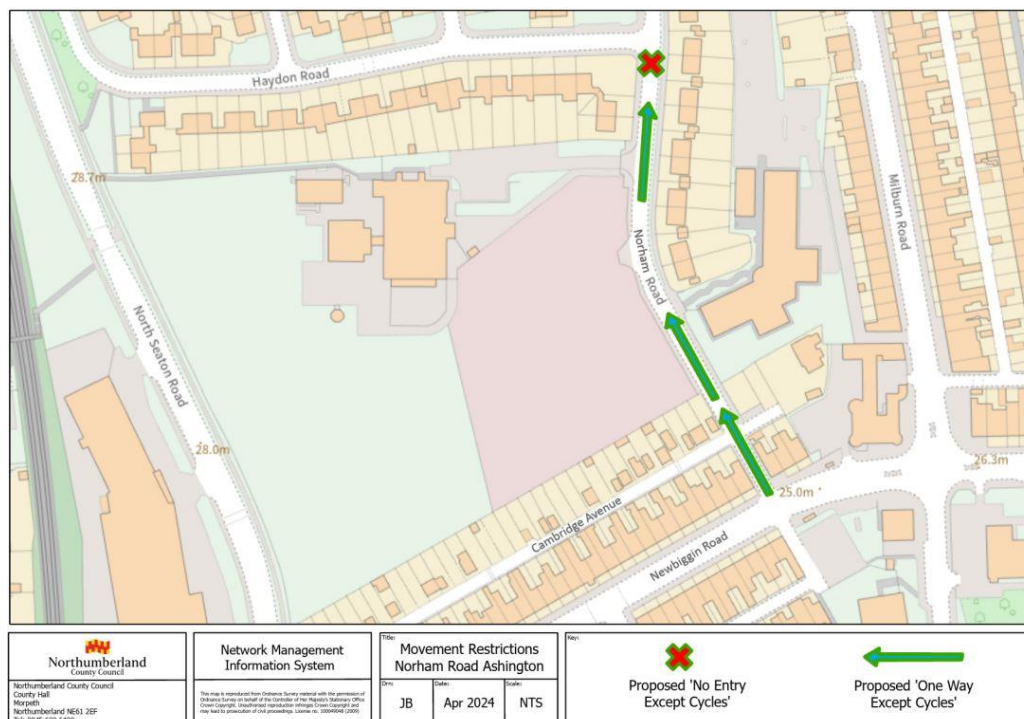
Proposed new one-way and no entry system at Norham Road, Ashington
